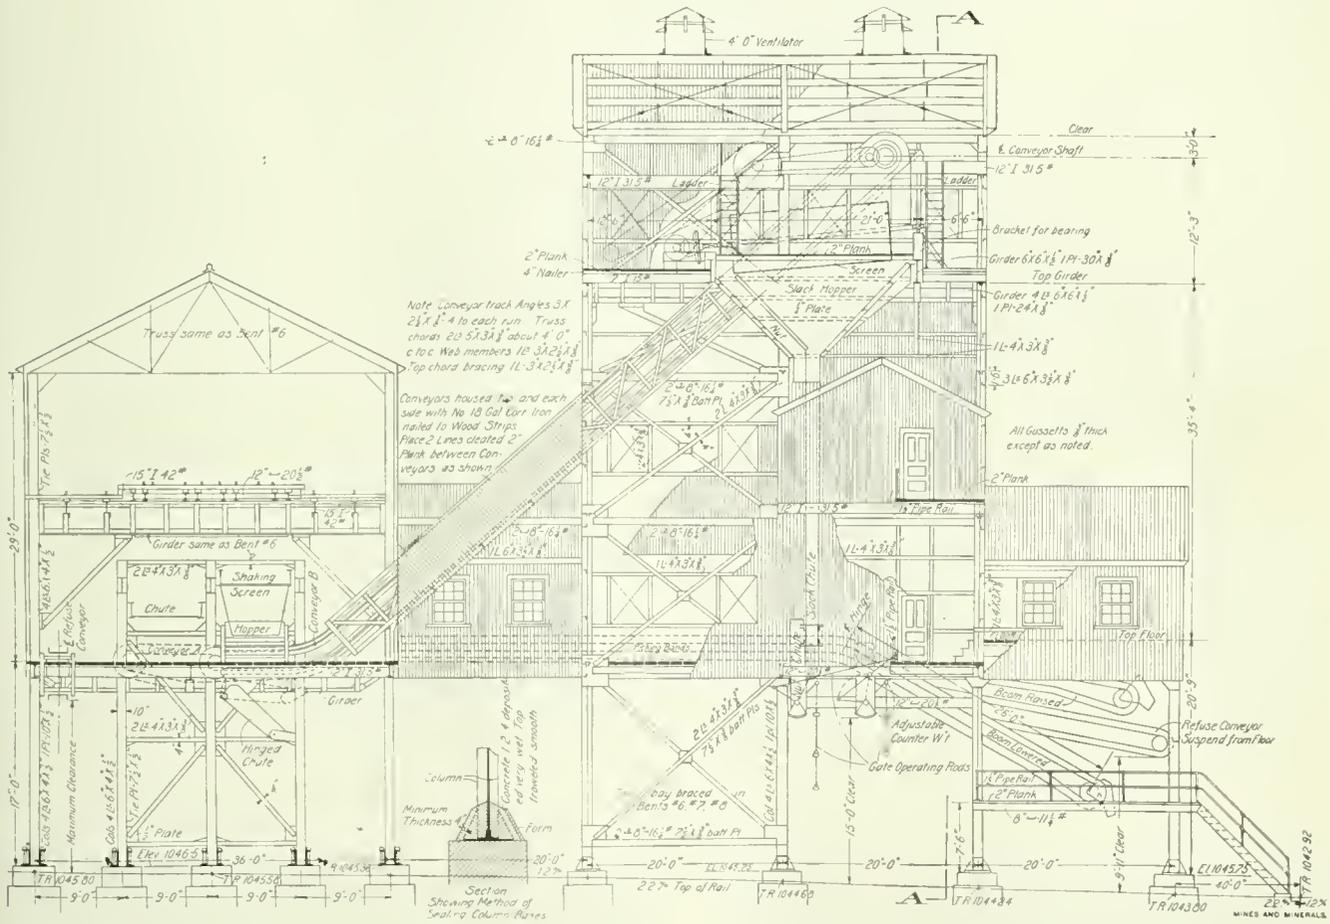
SIDE ELEVATION OF HOISTING SHAFT TIPPLE
